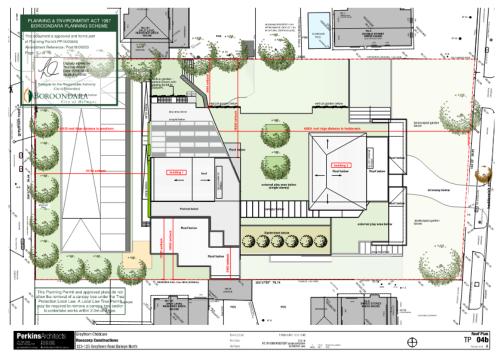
Endorsed Roof Plan (Post18/00223 - 15/8/2015)
